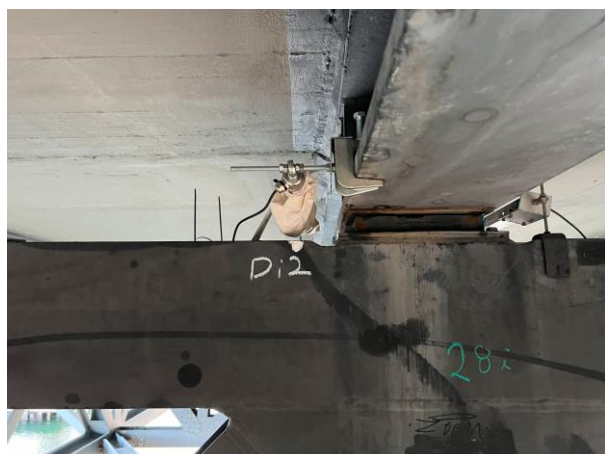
deck structure supported by the steel cross truss by elastomeric bearings.
